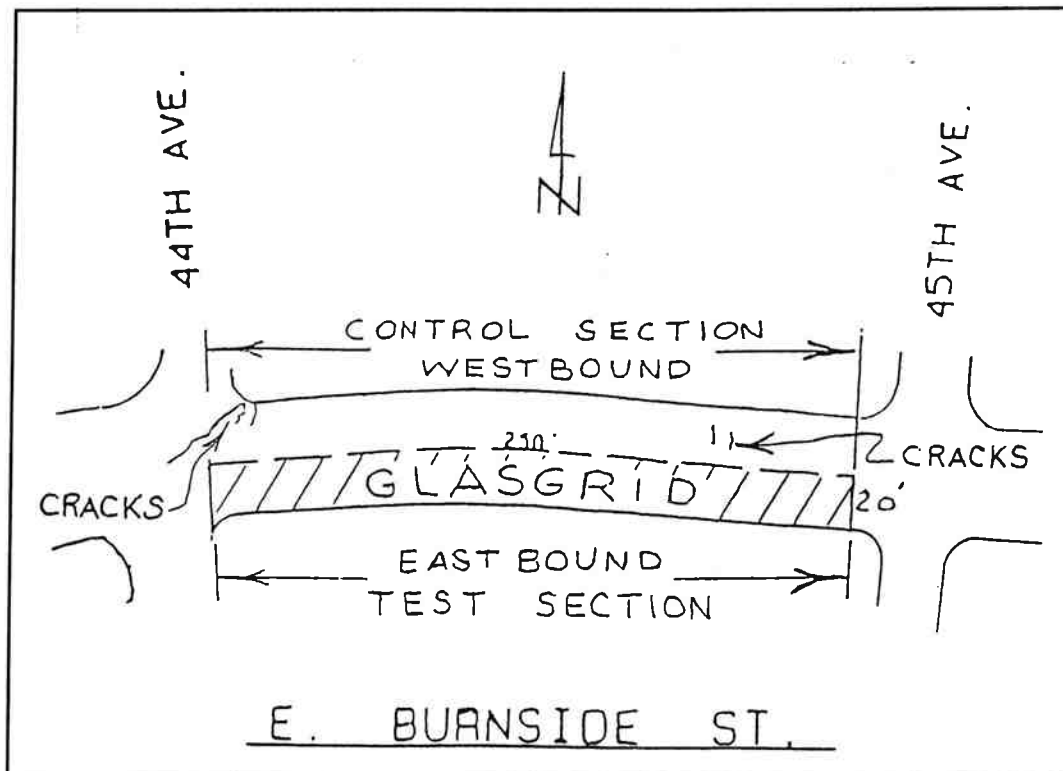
Cracks in the Asphalt Concrete Overlay
